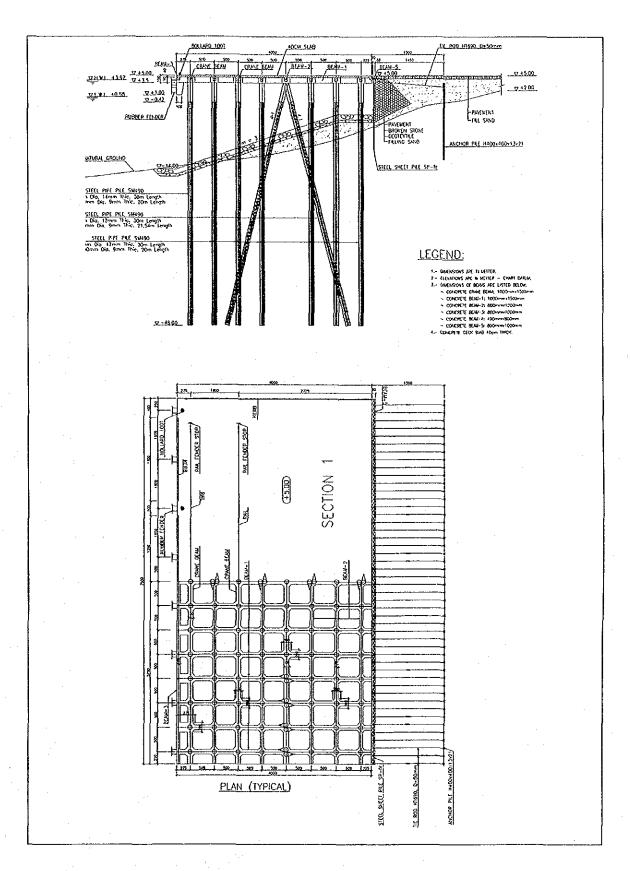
Typical Plan and Section of G.C. Quay Structure
